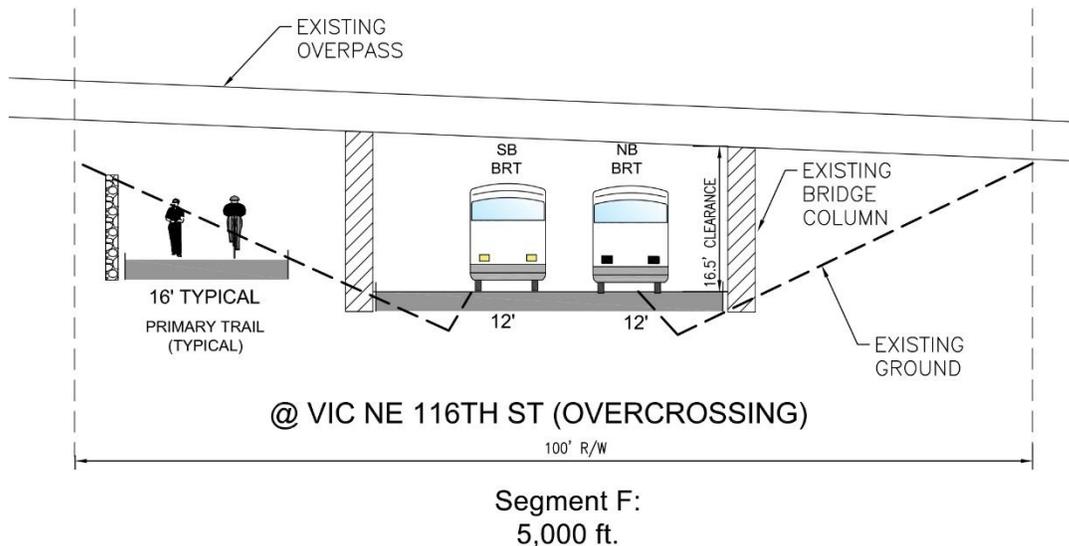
Typical cross section for 116th Avenue NE to NE 120th Street segment
